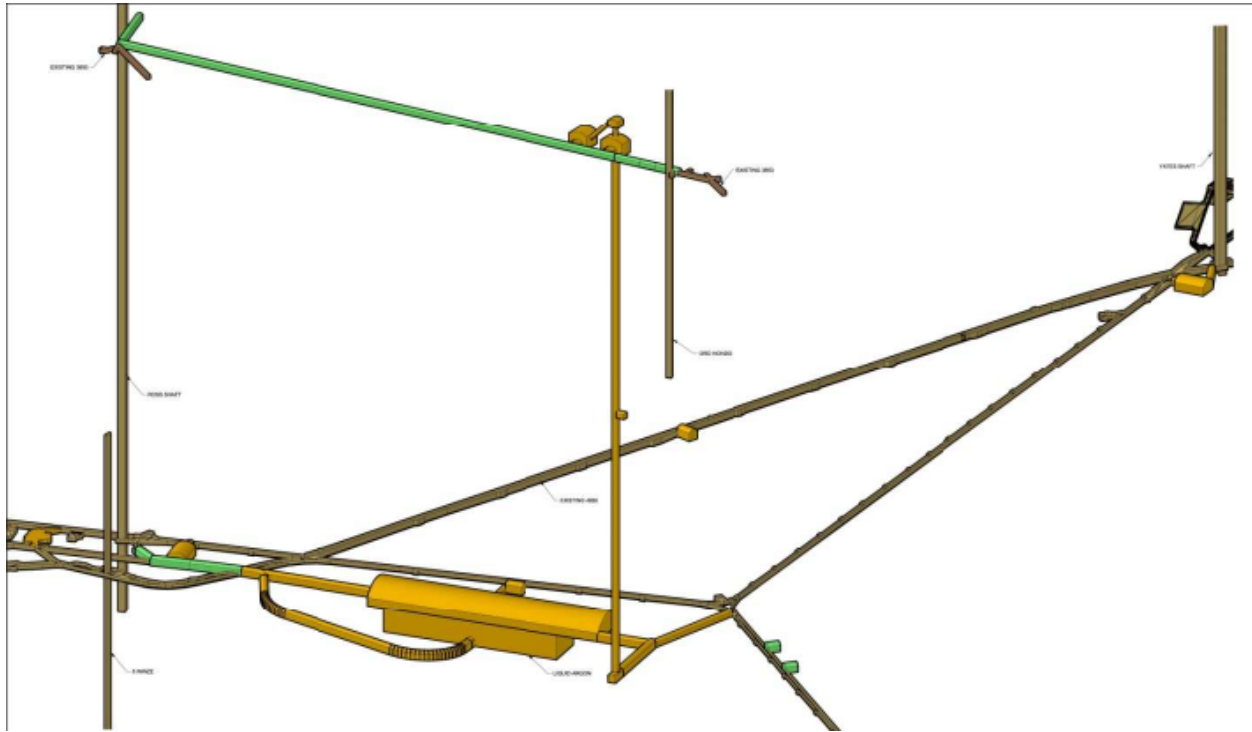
Schematic of underground conventional facilities for an LArTPC at the 4850L
